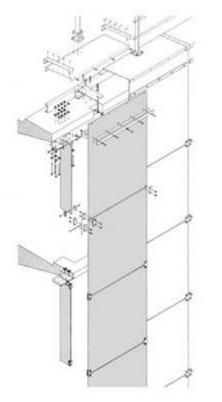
Technical drawing for glass fin technology used in Willis Faber & Dumas office building [13]
